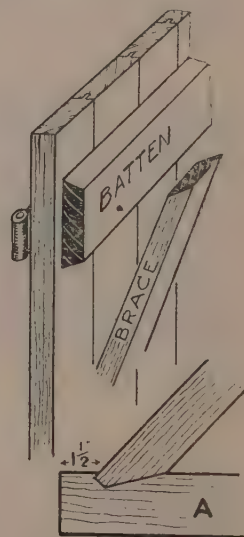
SHOWING BEVEL ON BRACE AND BATTEN.
